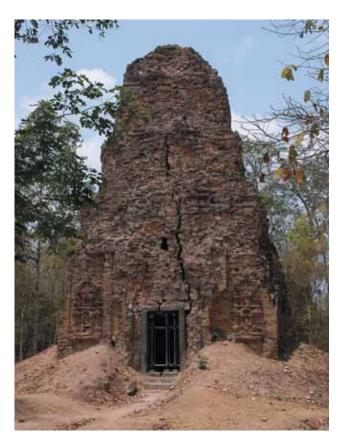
Collapse around and above door opening (N11 shrine in Prasat Sambor, M.20).
